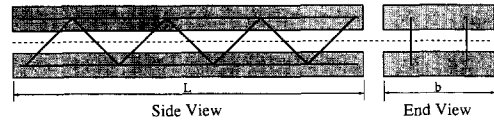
Insulated Sandwich Panel with Truss-Type Connectors
